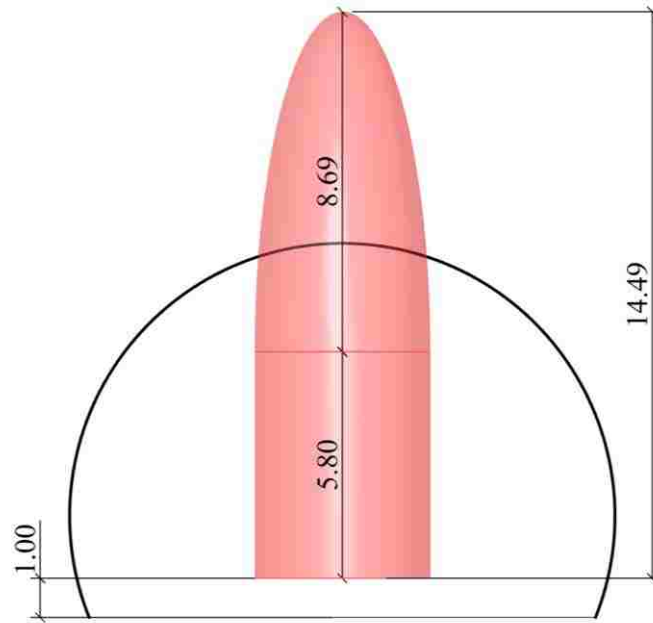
Dimensioned free flame in tunnel cross section (*m*)
